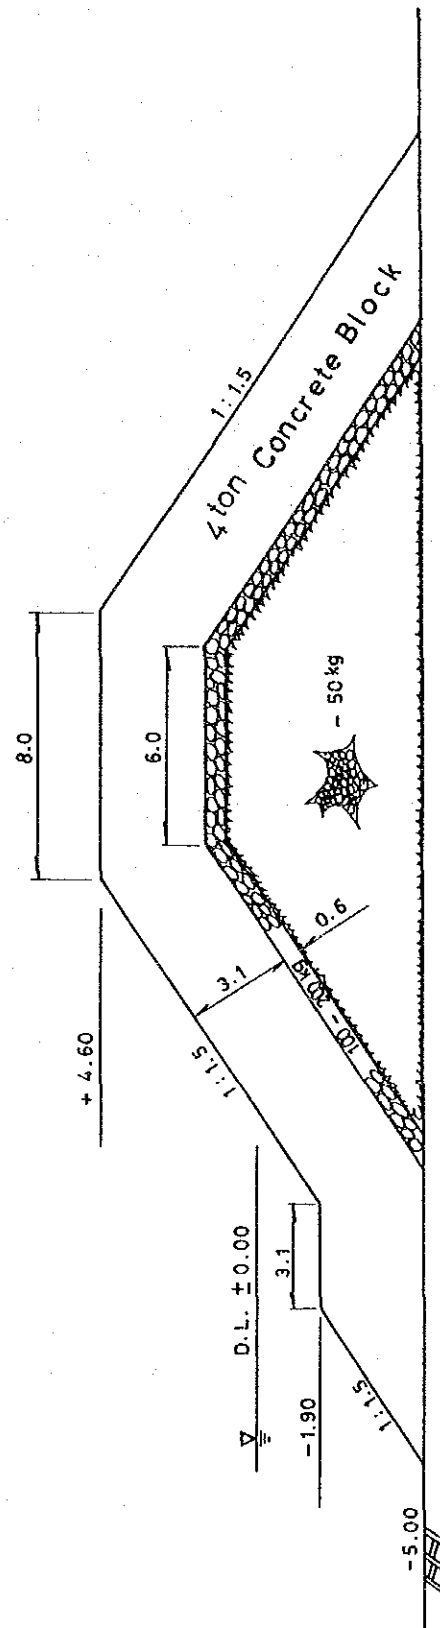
Standard Cross Section of Breakwater Repair (Unit:m)
